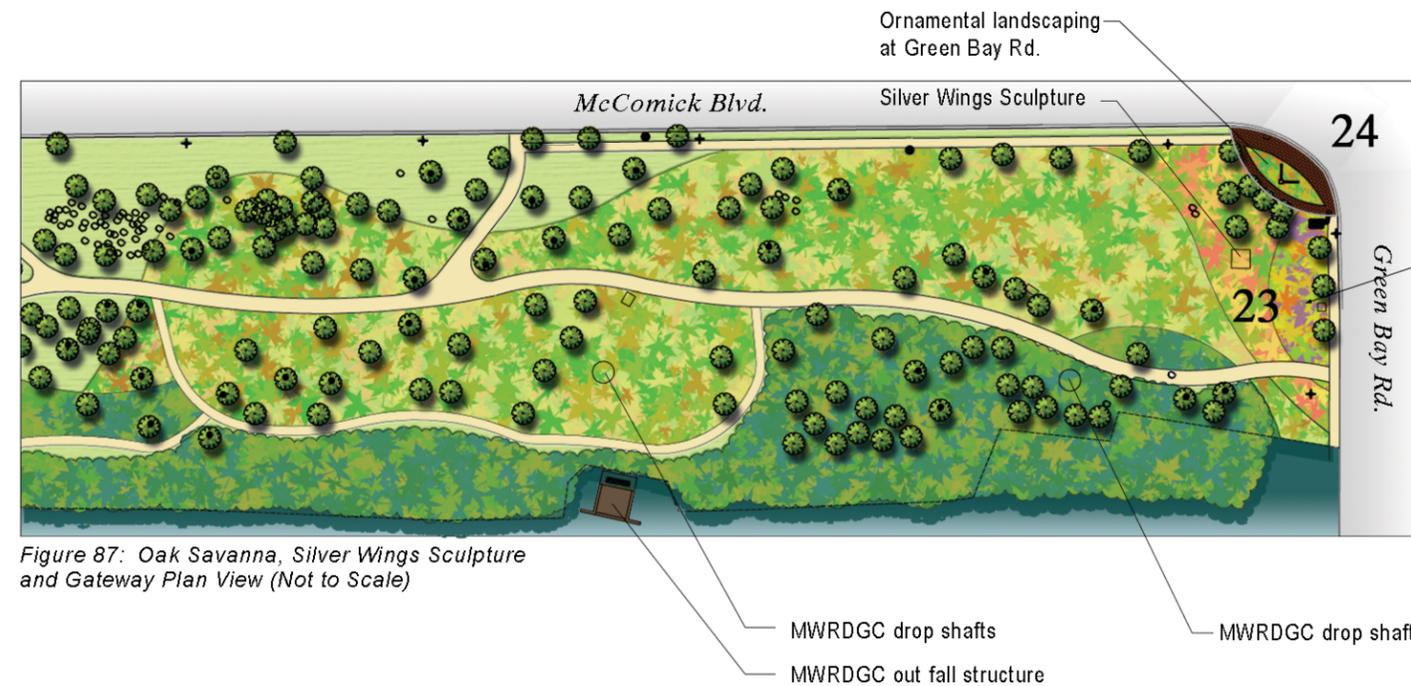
Oak Savanna, Silver Wings Sculpture and Gateway Plan View (Not to Scale)
